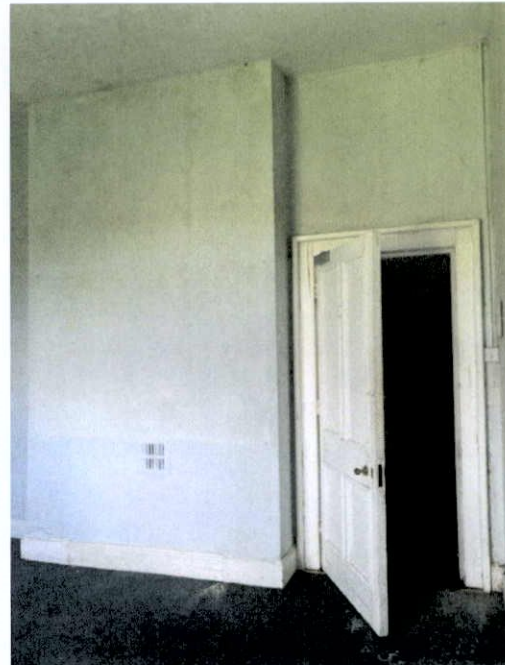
No chimney piece. Original joinery. Staining of ceiling suggestive of water ingress.
